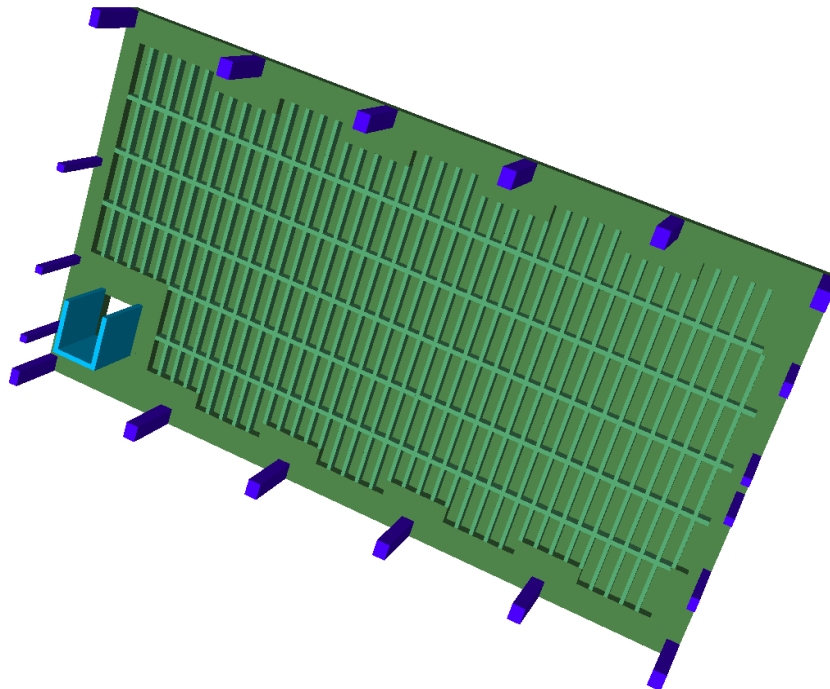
3-D VIEW OF A POST-TENSIONED JOIST SLAB CONSTRUCTION
